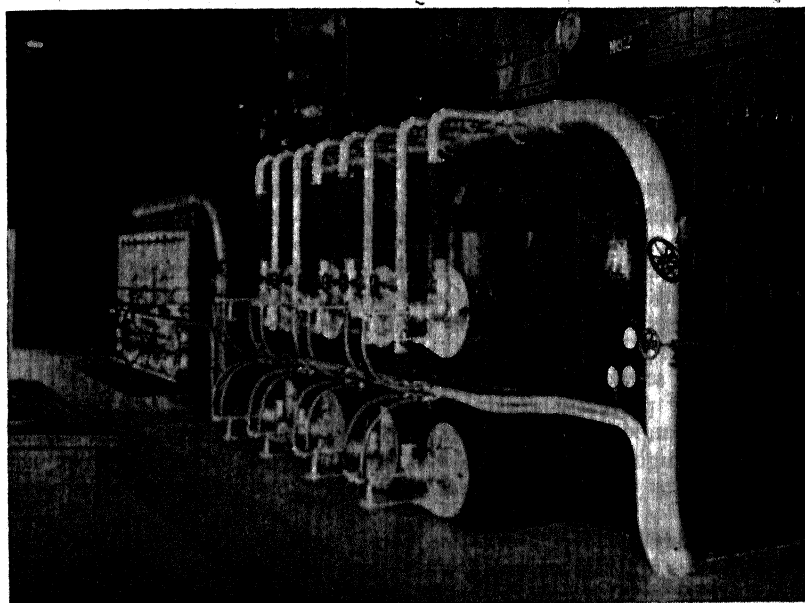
Arc welded gas feeder lines for steam boilers. 6-in. line leads in from 12-in. header in basement and branches into eight 2 1/4-in. burner lines.
